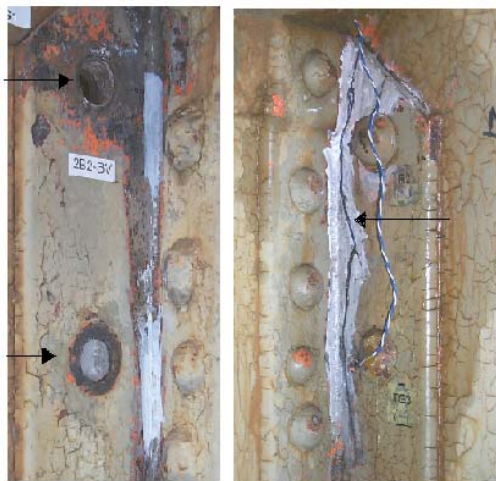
Examples of fatigue damage in riveted stringer-to-floor-beam connections.
